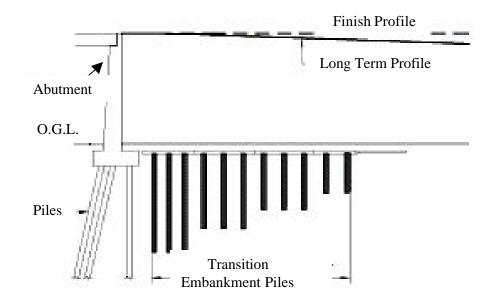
Piled Embankment with Transition Piles after Sew, et al., (2001).
